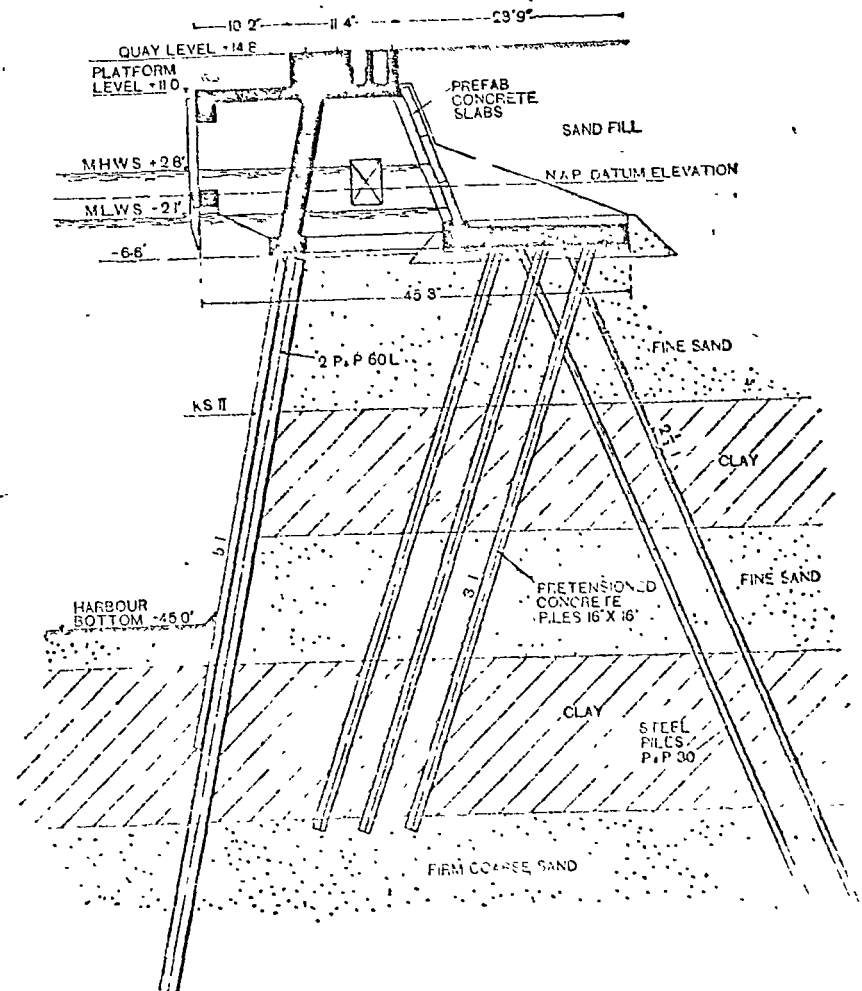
SWARTTOUW QUAY WALL CROSS SECTION
